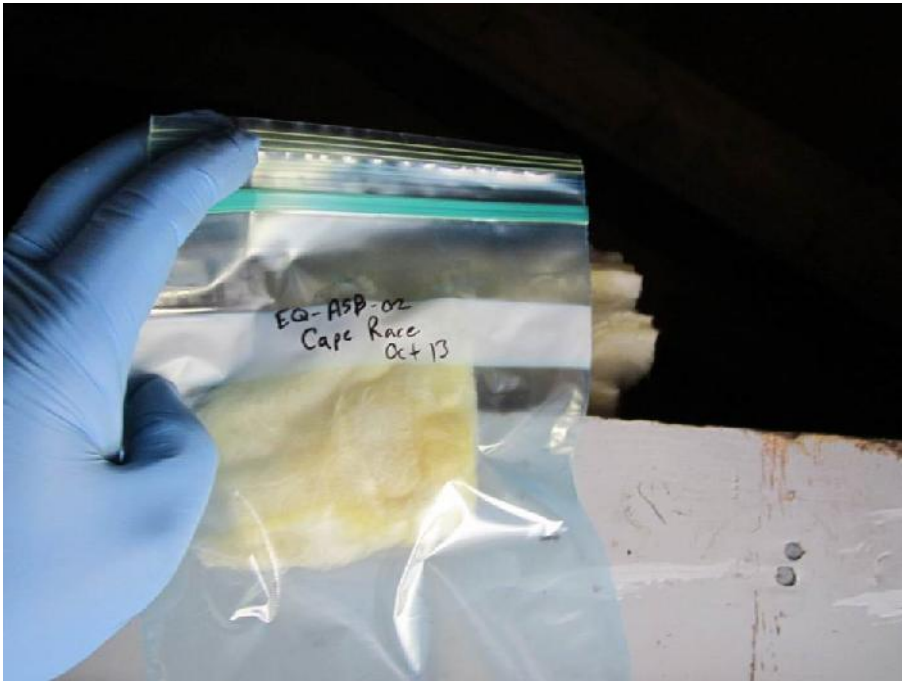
View of location of fiberglass insulation sample EQ-ASB-02 (ceiling).
